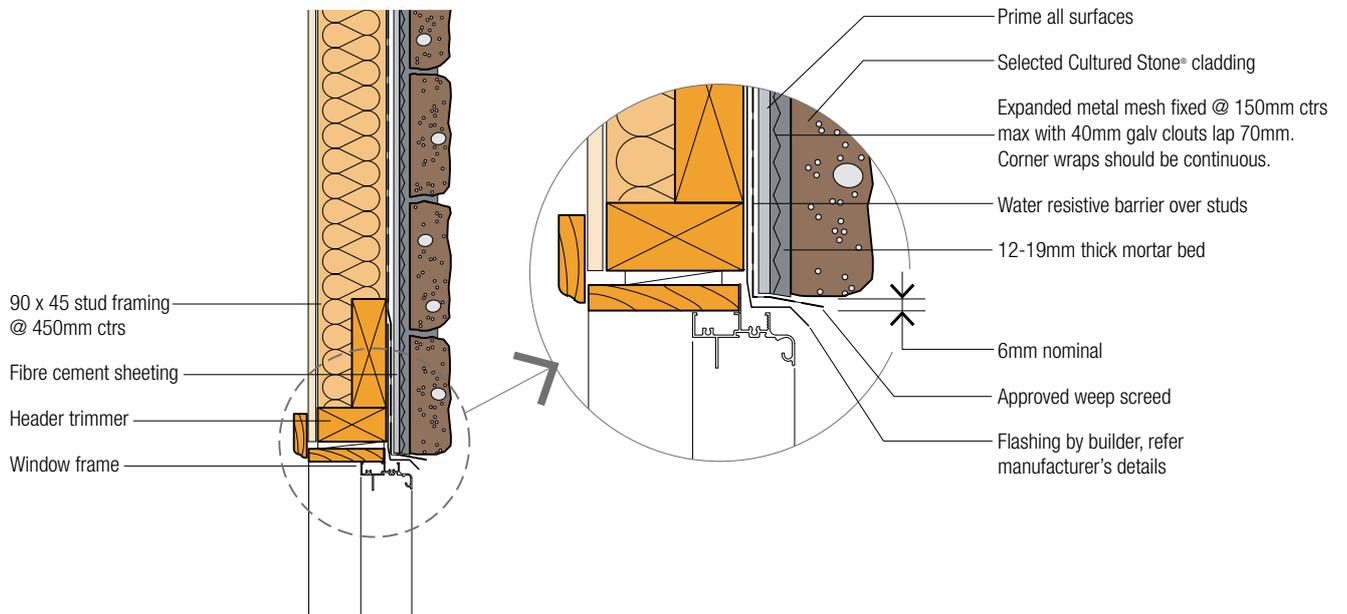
Typical Window Head - Section (Dwg # CS-07.01)
